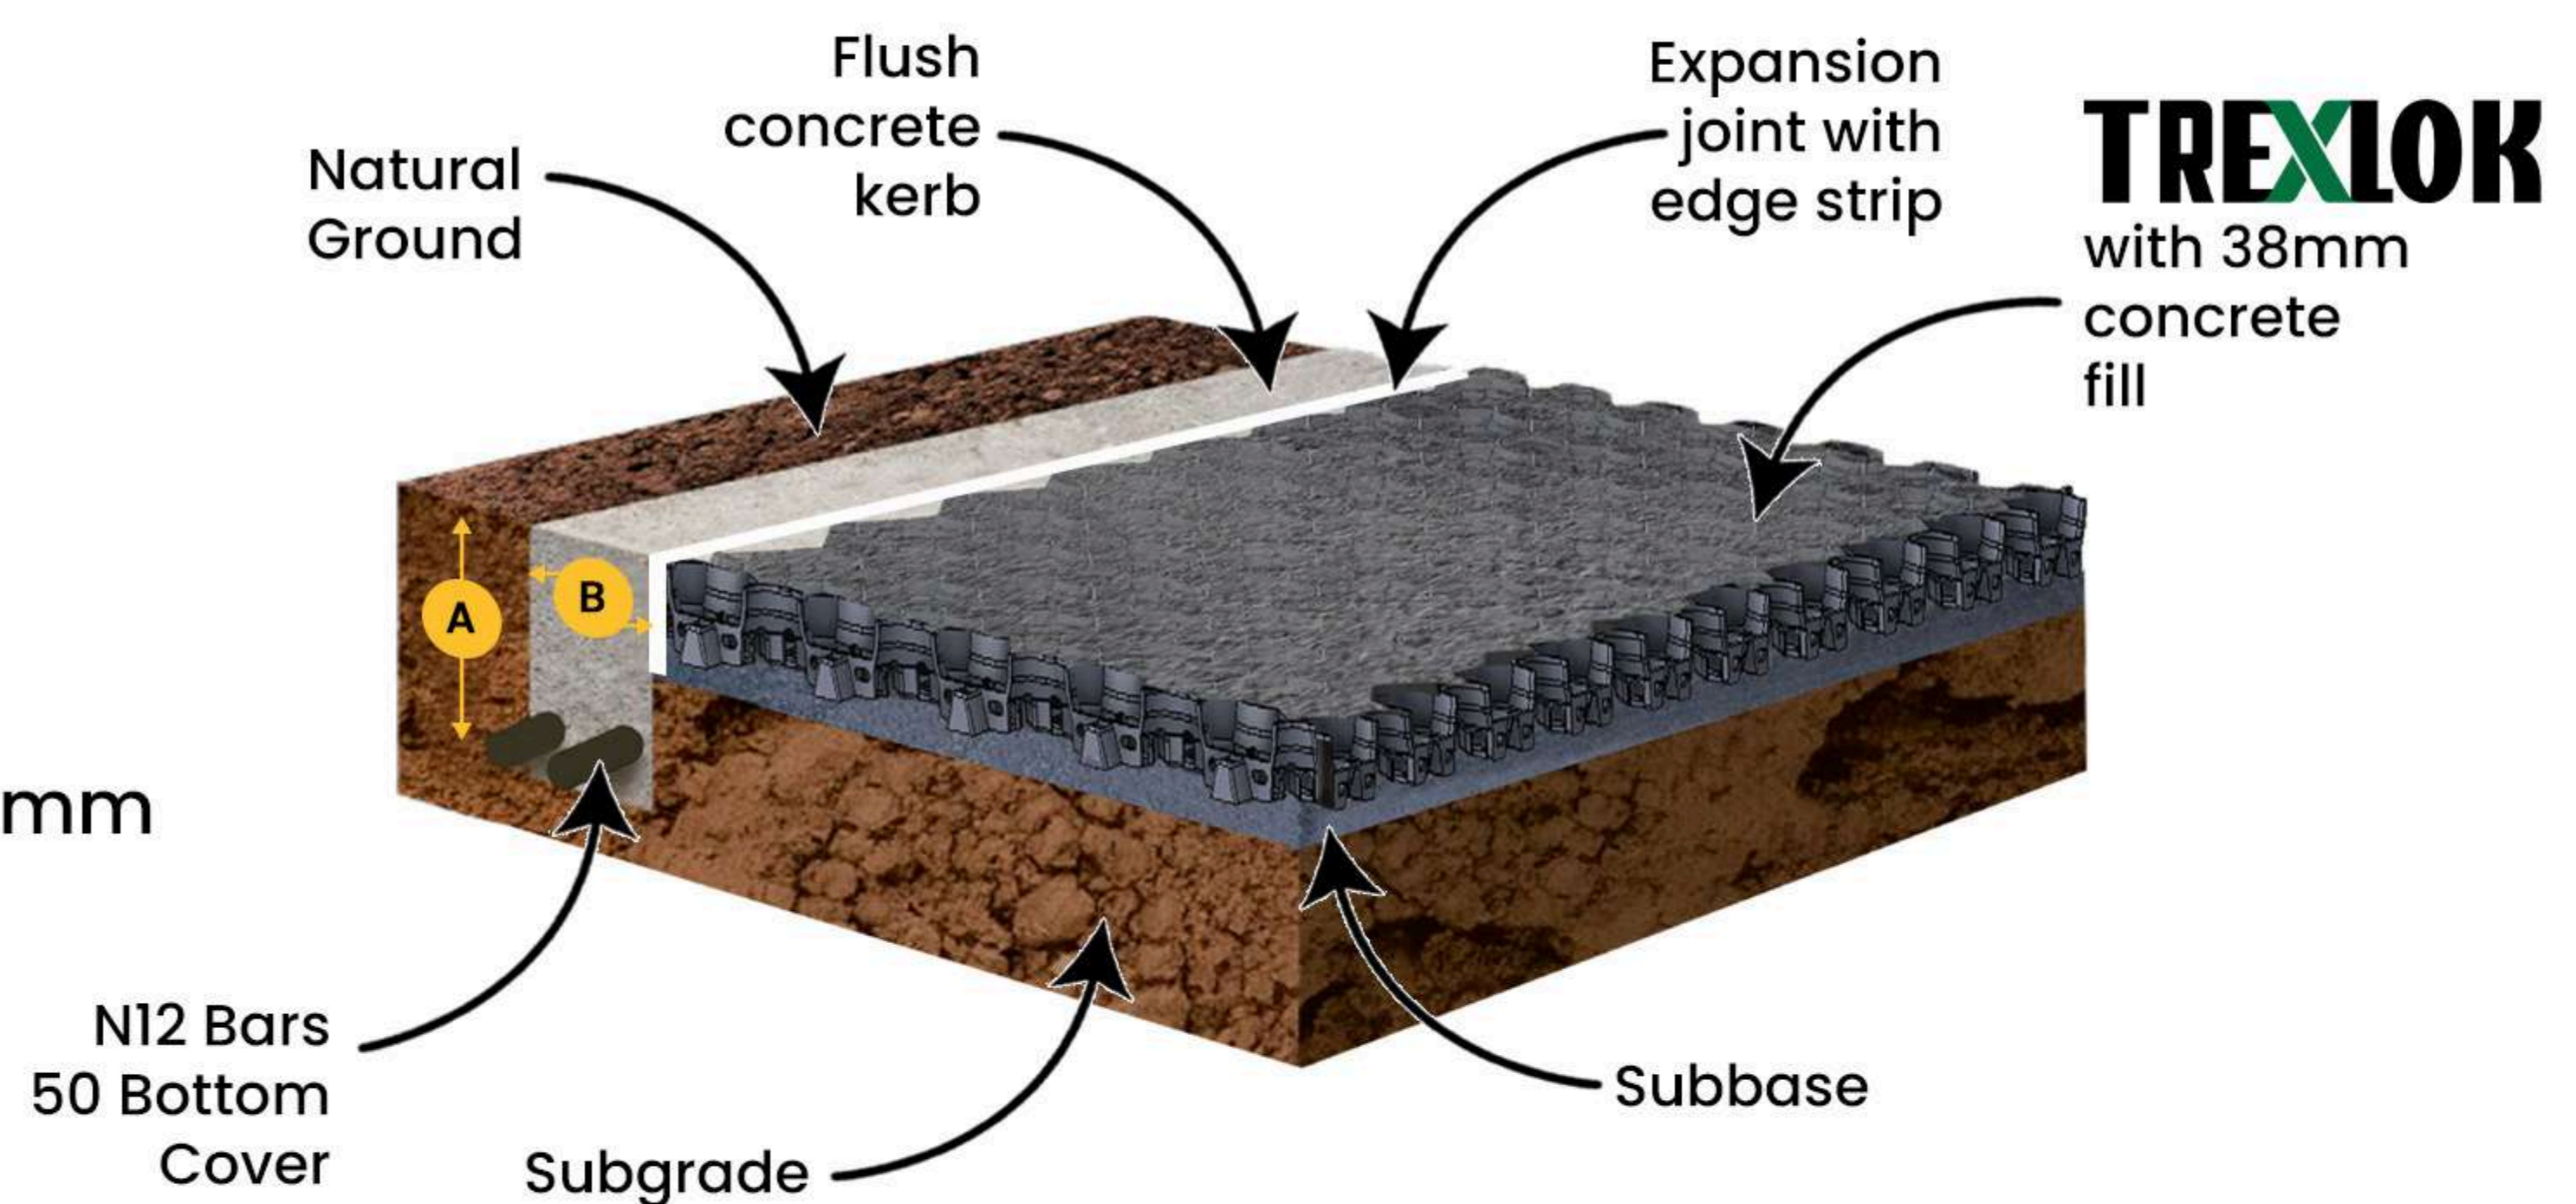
Edging for standard pavements using “TREXLOK Edge Strip”.
